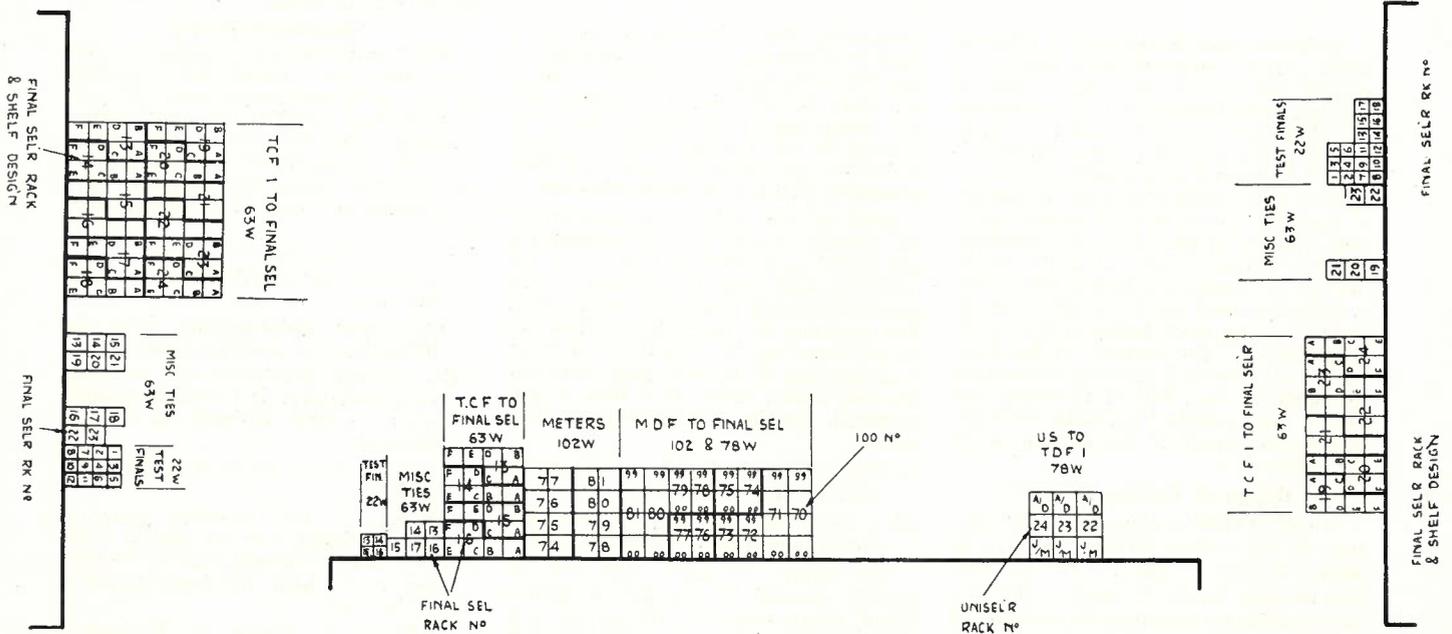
Cable sections A-A, B-B and C-C of Fig. 12.
